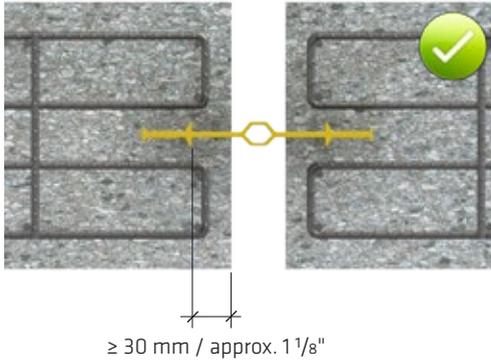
Anchorage of internal expansion joint waterbar with ≥ 30 mm concrete cover
